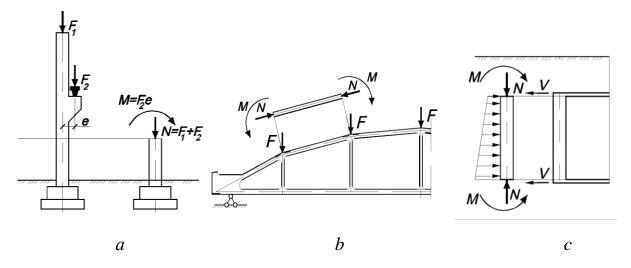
Structures and their members under compression: a - a column of an industrial building; b - a top chord of a truss; c - a wall of underground tank rectangular in plan
